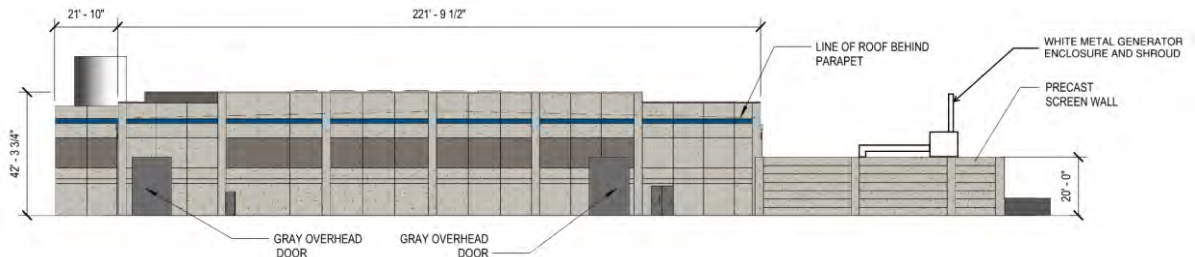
Elevation view of a typical “end cap” barrier wall (“Precast Screen Wall”).
